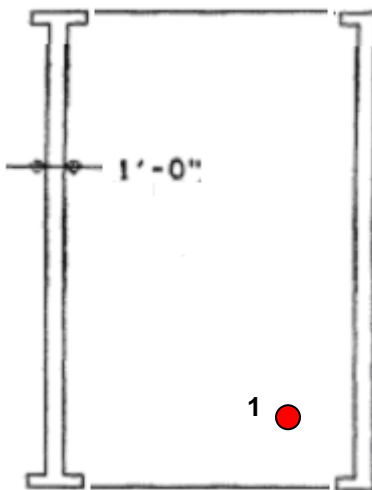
Plan view of 2-wall Holloman AFB magazine cube.
